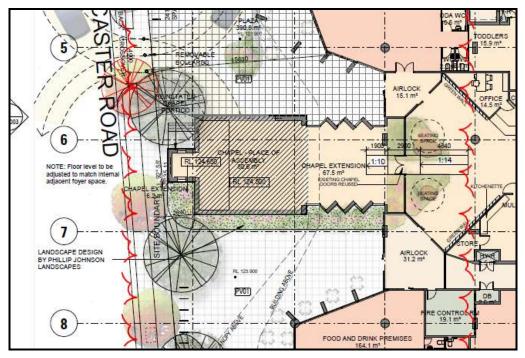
Excerpt from the proposed plans detailing proposed Chapel modifications
